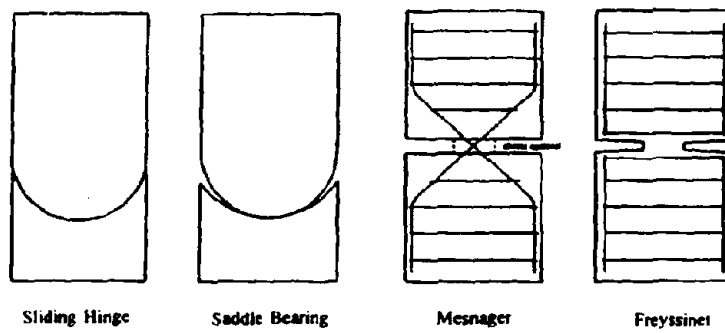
Types of Concrete Hinges (after Ref. 9).
